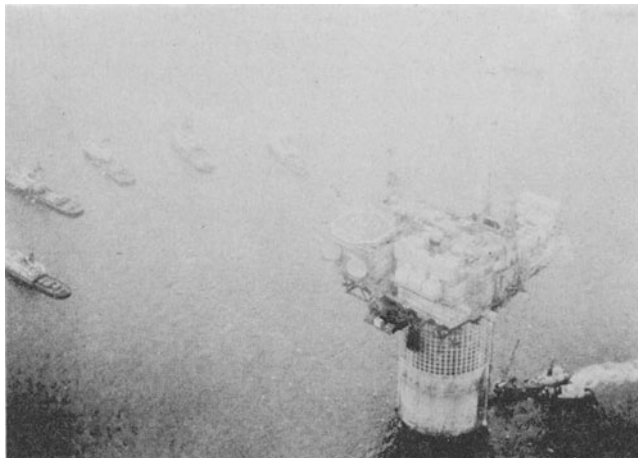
Ninian Platform under tow, supporting 23 400 tonnes payload
